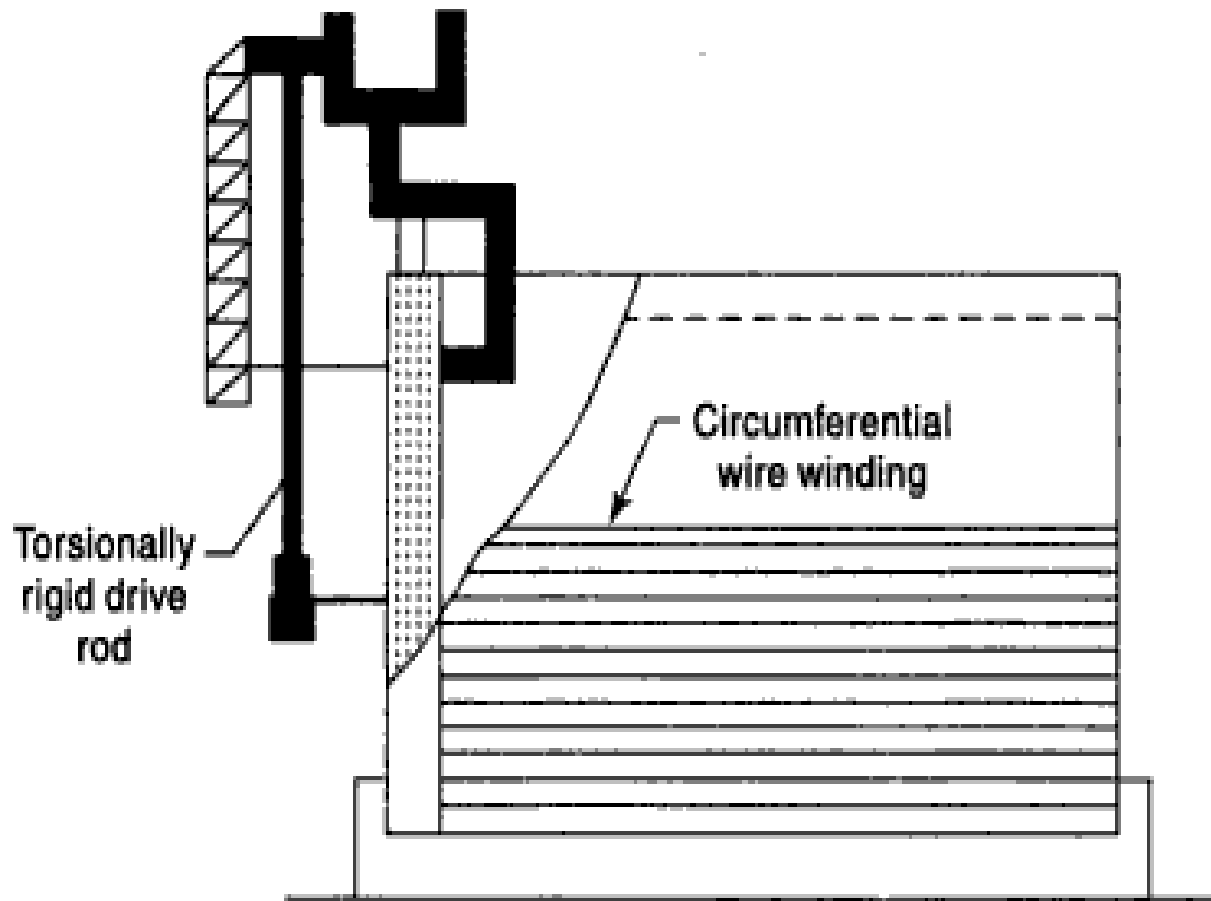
Wire Winding Machine for Circular Cylindrical Tanks
